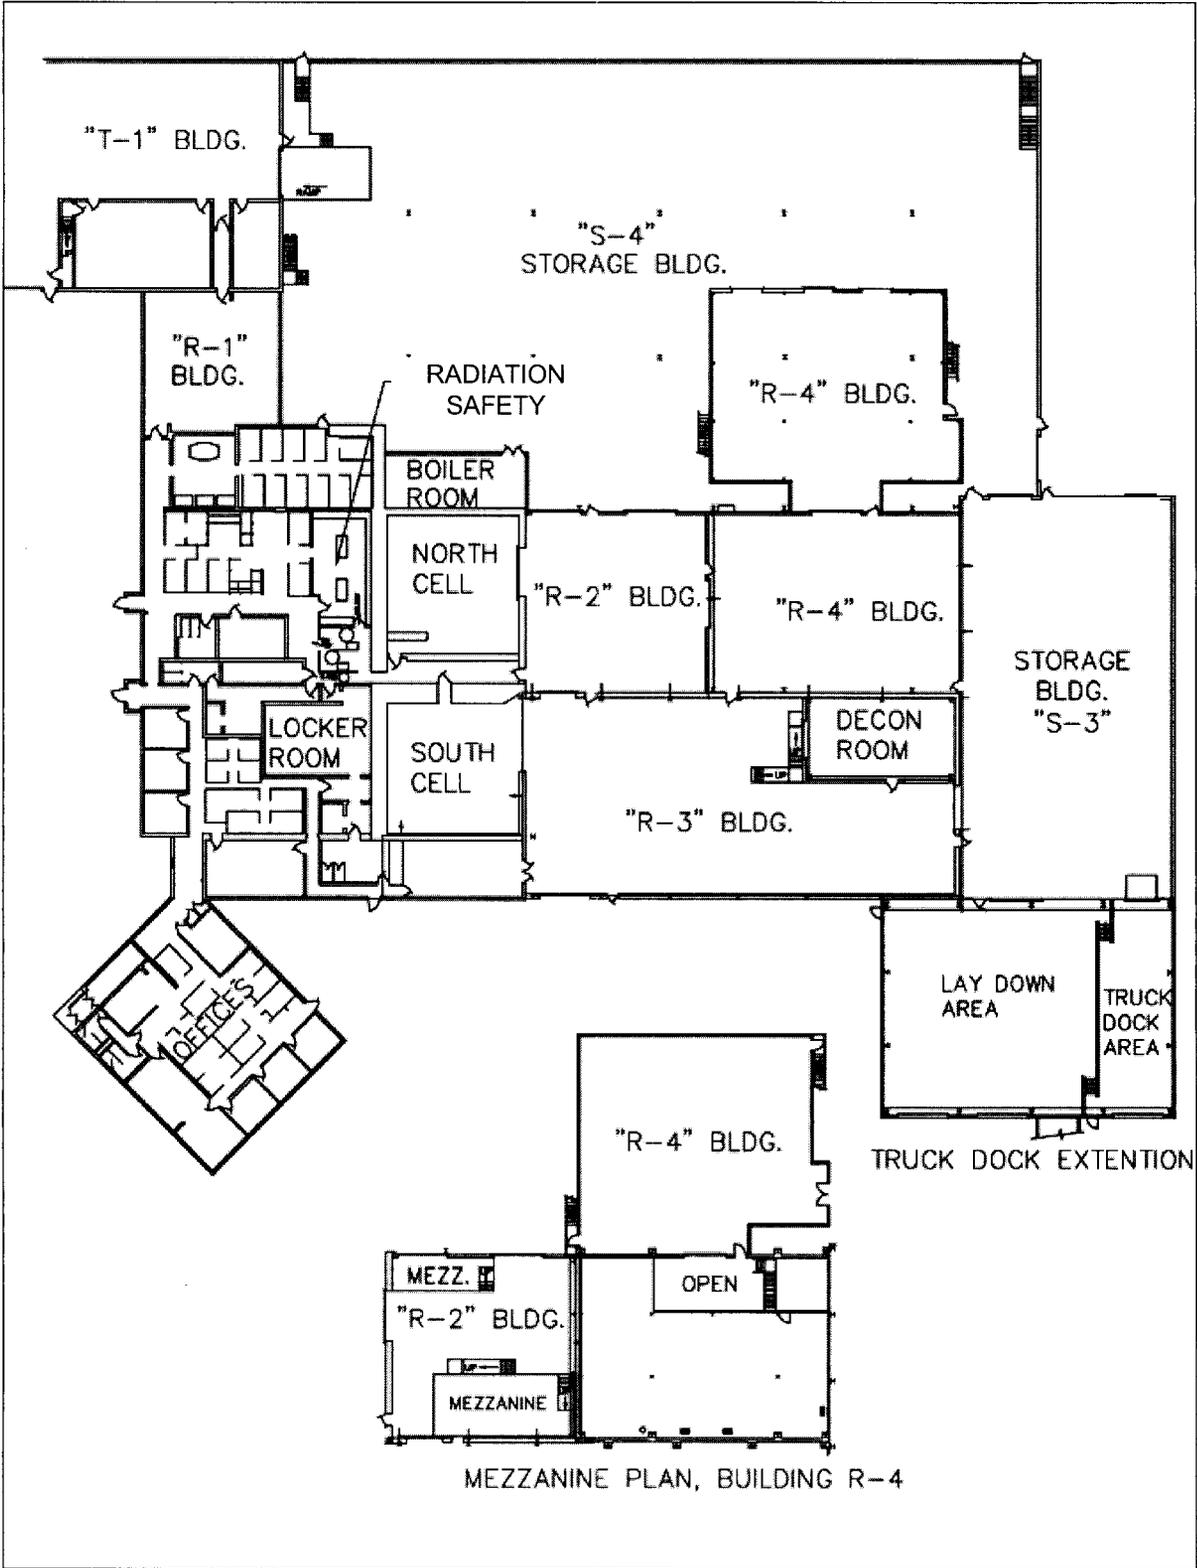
Service Center Floor Plan - R1, R2, R3, and R4 Buildings and S3 and S4 Buildings
